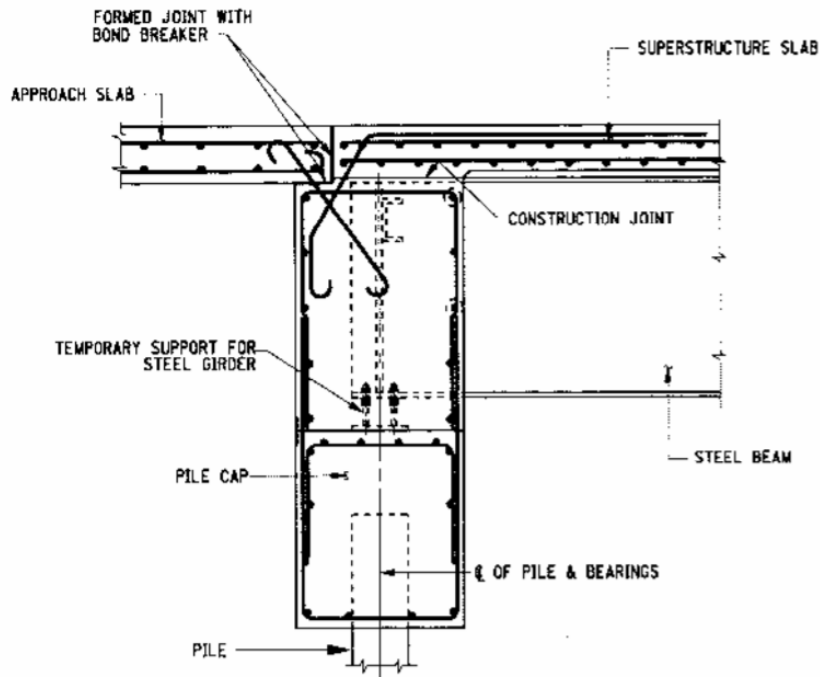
Integral abutment bridge detail in New York State DOT. Source: Hoppe et al, 2016, courtesy of NYSDOT.
